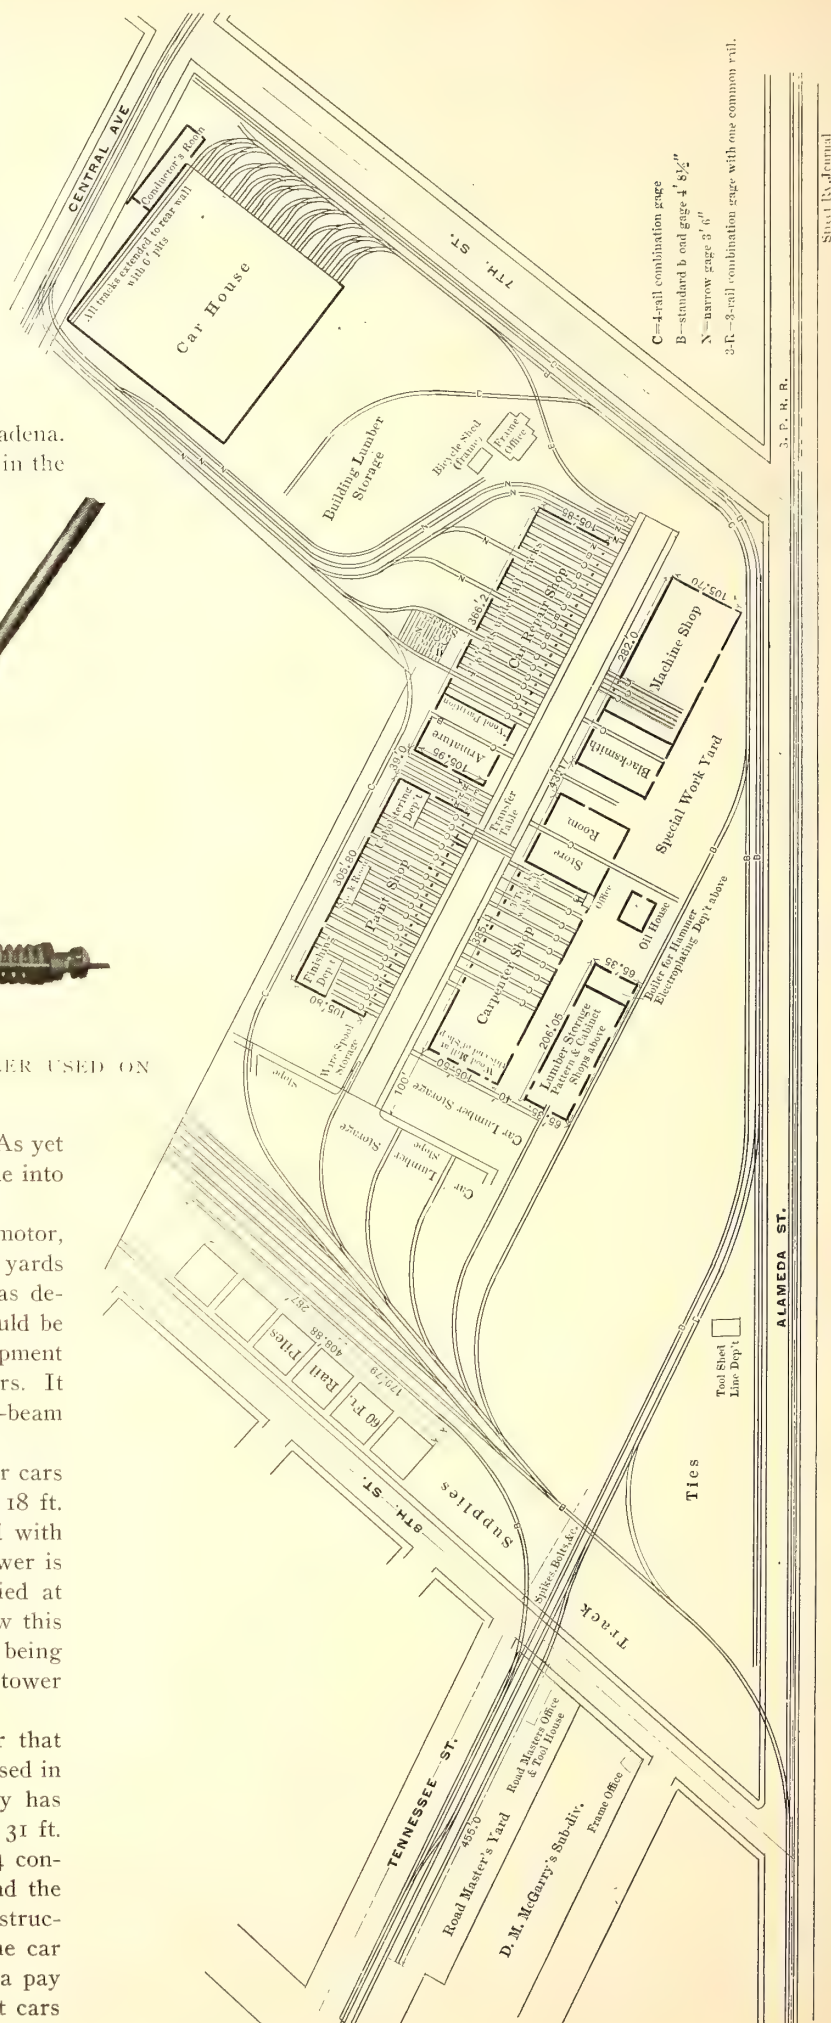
PLAN OF CAR HOUSE, YARDS AND SHOPS
